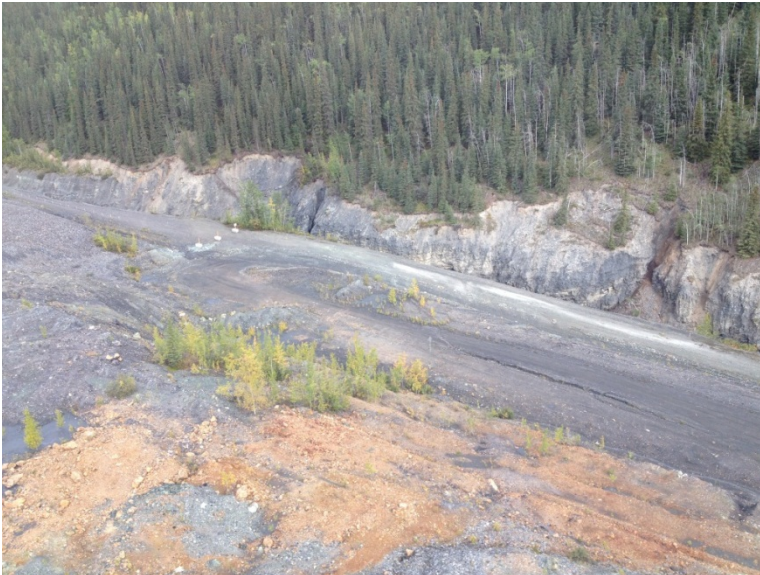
Access Road at Primary Ford Crossing looking south.
